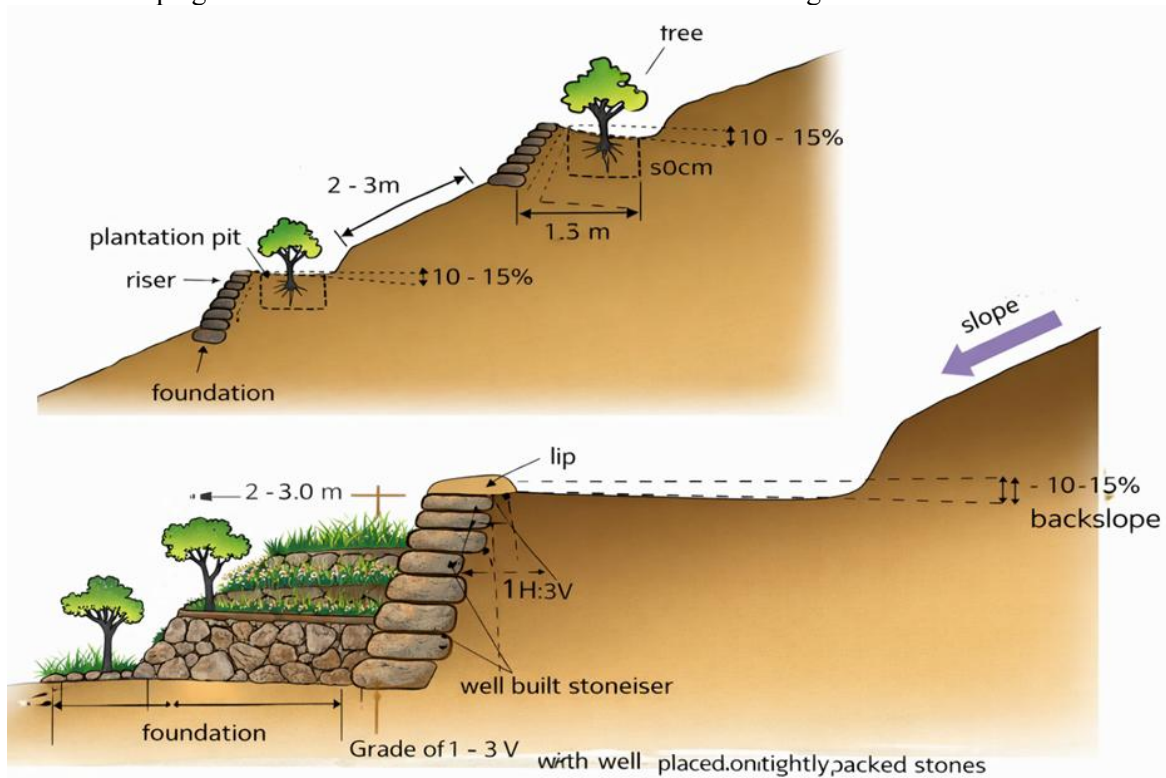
Layout and cross-section of a hillside terrace showing foundation trench, stone riser, back slope, and terrace spacing.
